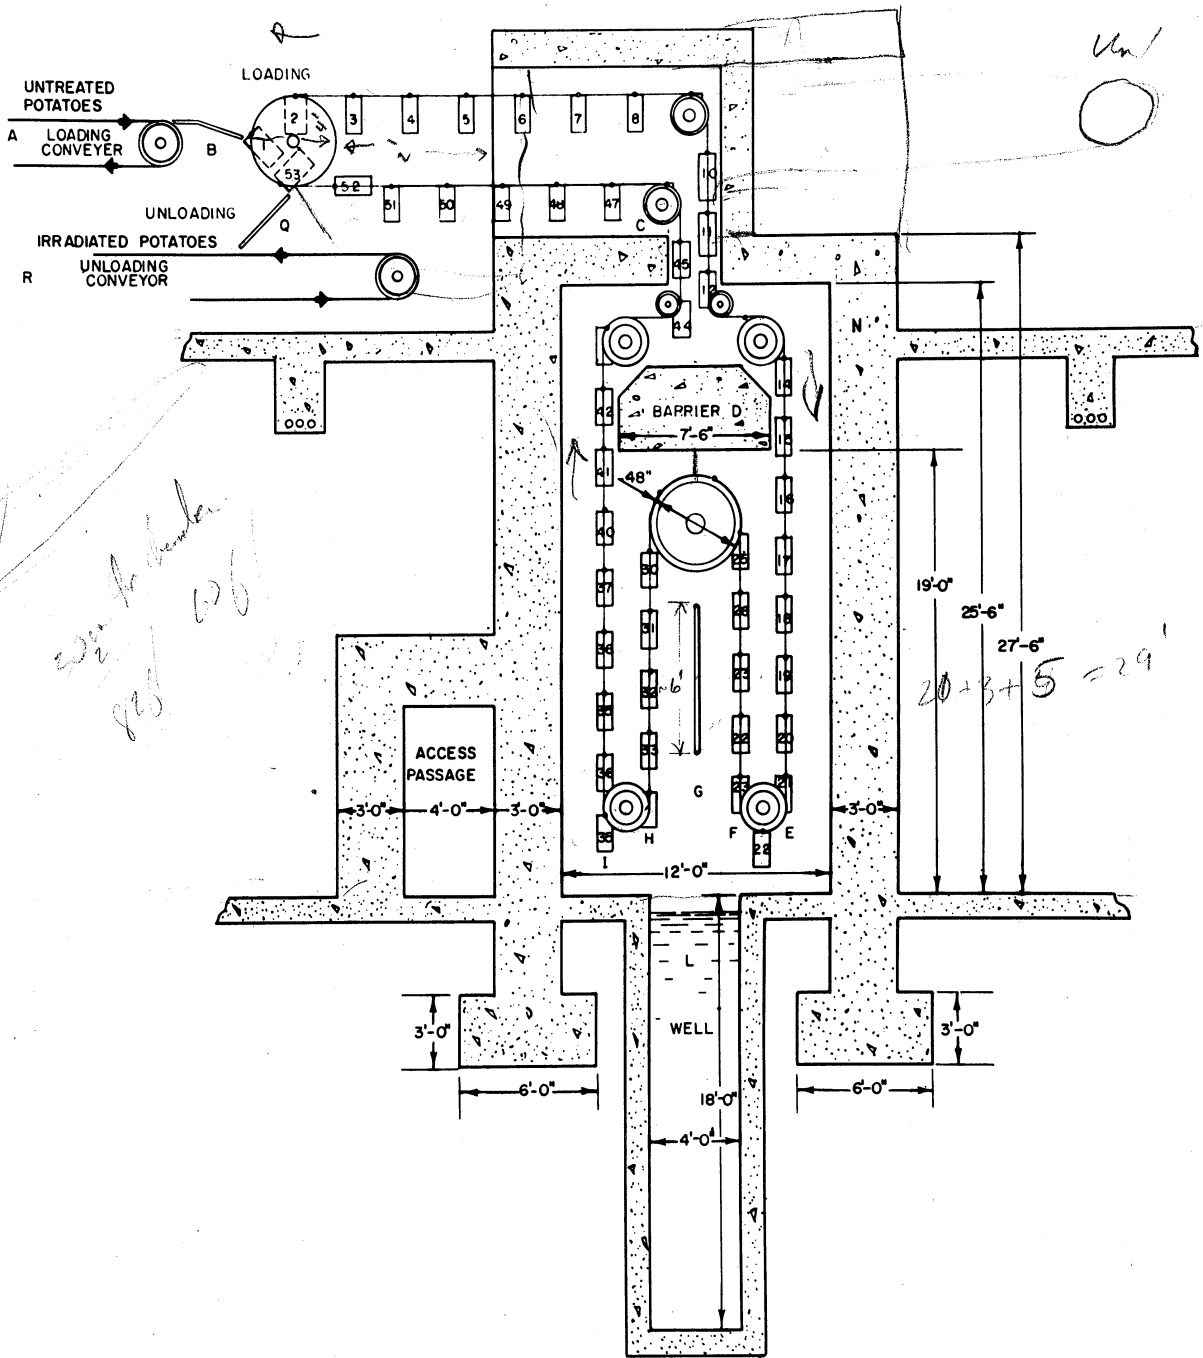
Elevation View of Potato Irradiation Chambers Using Cesium-137 or Mixed Fission Products.
